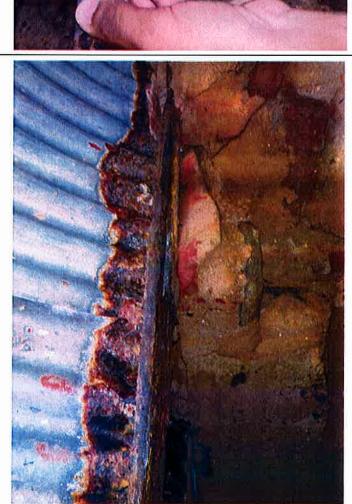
Girder G3 bottom flange end at abutment 2 with laminated rust and section loss. Photo # 11:
